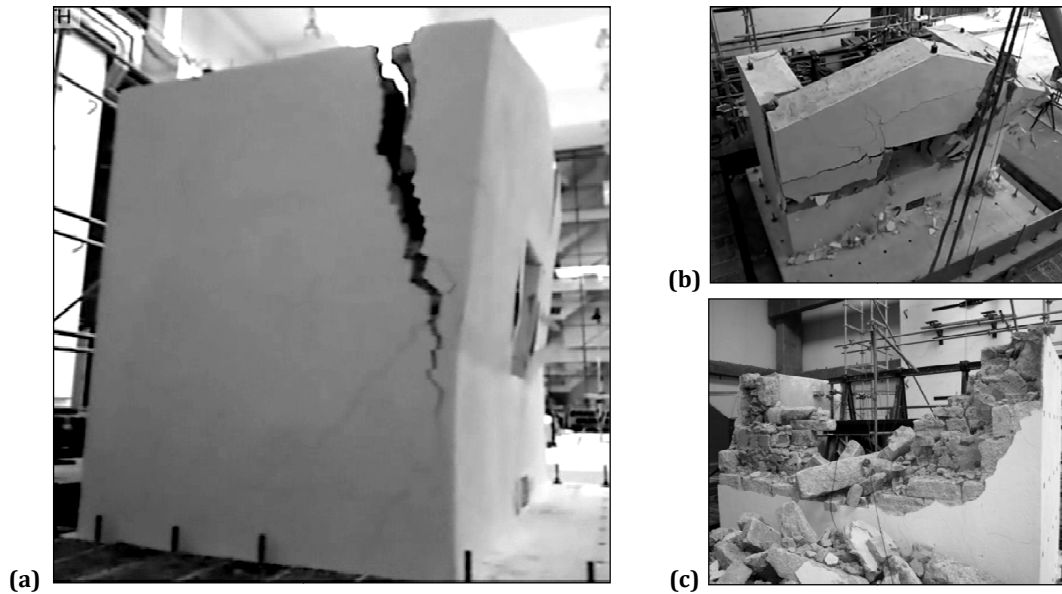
shows the specimen cracking pattern in the stage prior to collapse, where the formation of the main overturning mechanism is evidenced. Indeed, the outer leaf exhibited vertical flexural cracks as well as cracks in the window jambs (Figure 4.17 (a) and (b)), while the inner leaf showed the formation of the gable overturning mechanism, as obtained at the final collapse pattern (Figure 4.17 (c)). The horizontal crack at the window bottom level (which can be considered as a cylindrical hinge for the overturning mechanism) was formed only at the final L5 test stage (80%).
